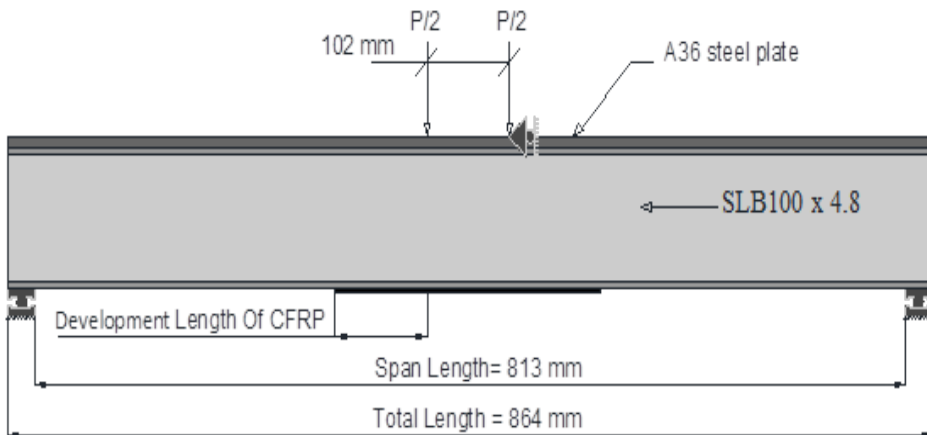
Geometry, Properties, and Loading Conditions of the Kirk Beam (Kirk, 2009).
